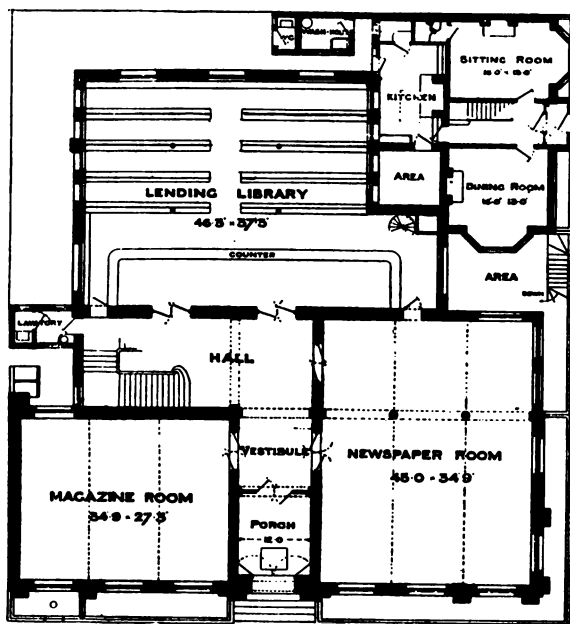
Plan of the ground floor of the "Tate" Central Library, Brixton.
